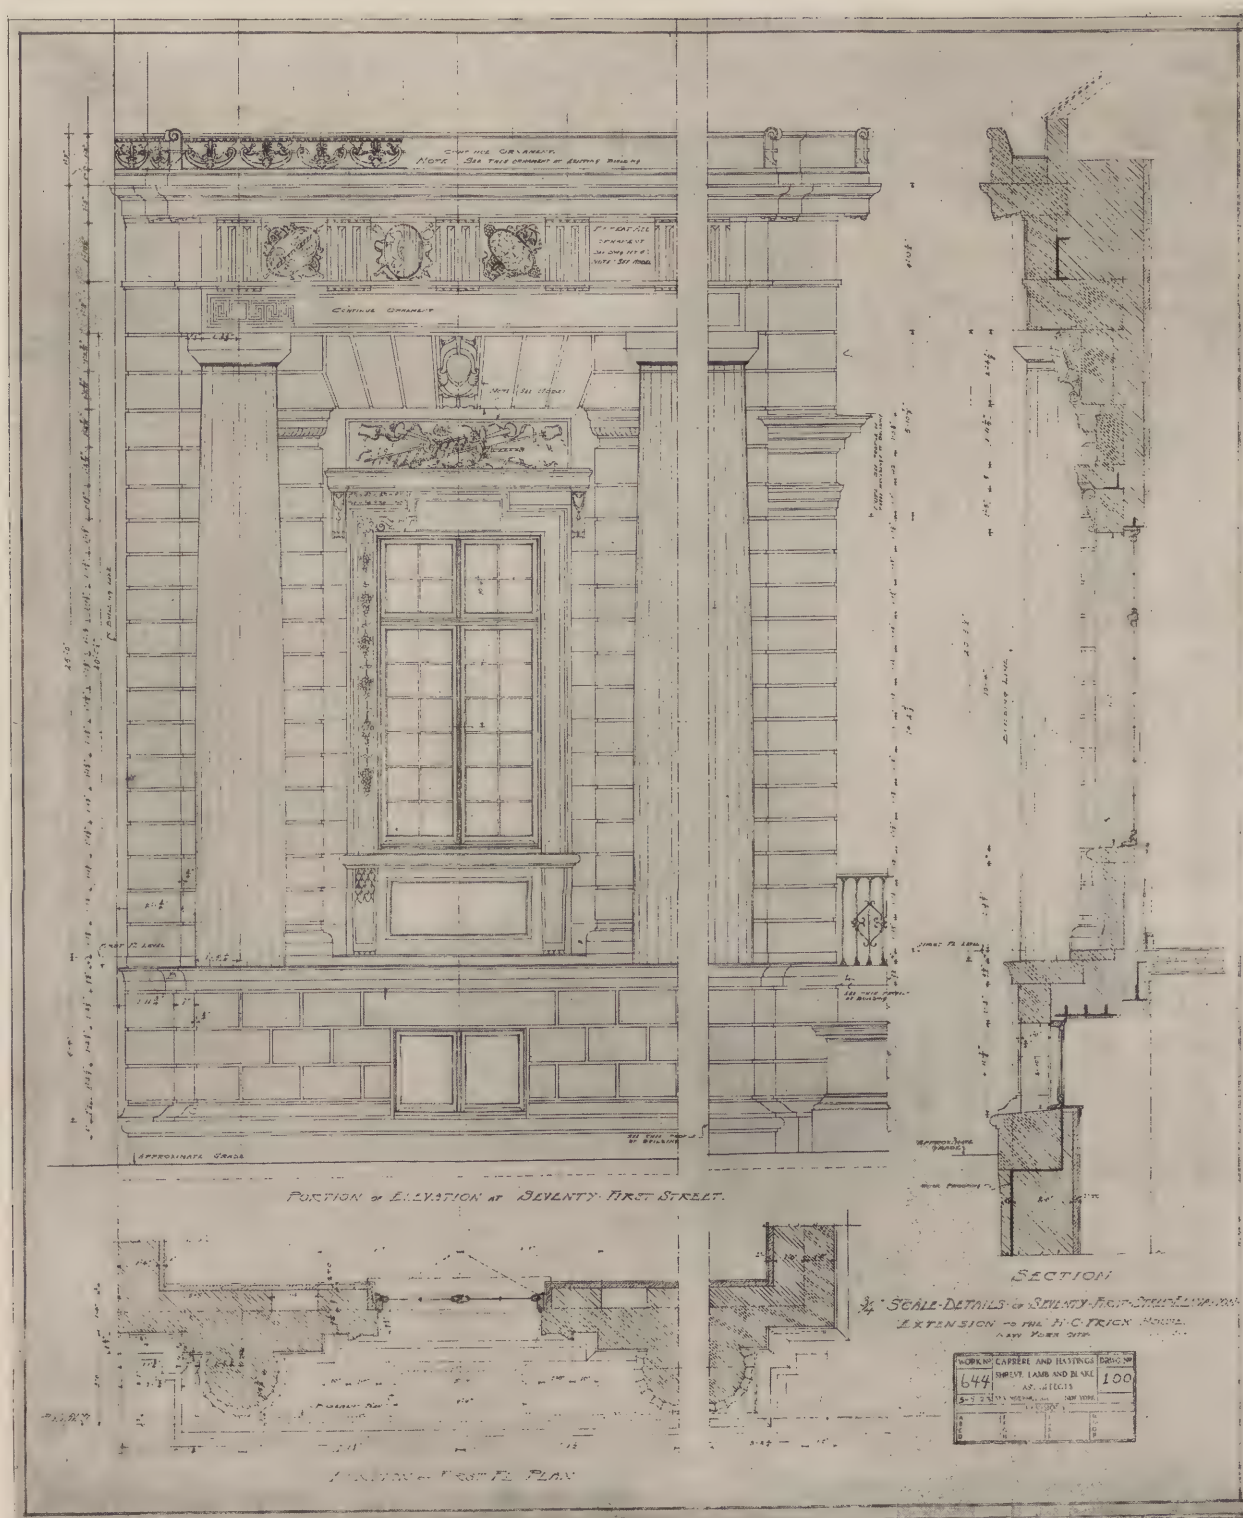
Extension to the H. C. Frick House, New York City. Seventy-first Street Elevation. Carrère & Hastings and Shreve, Lamb & Blake, Architects.
